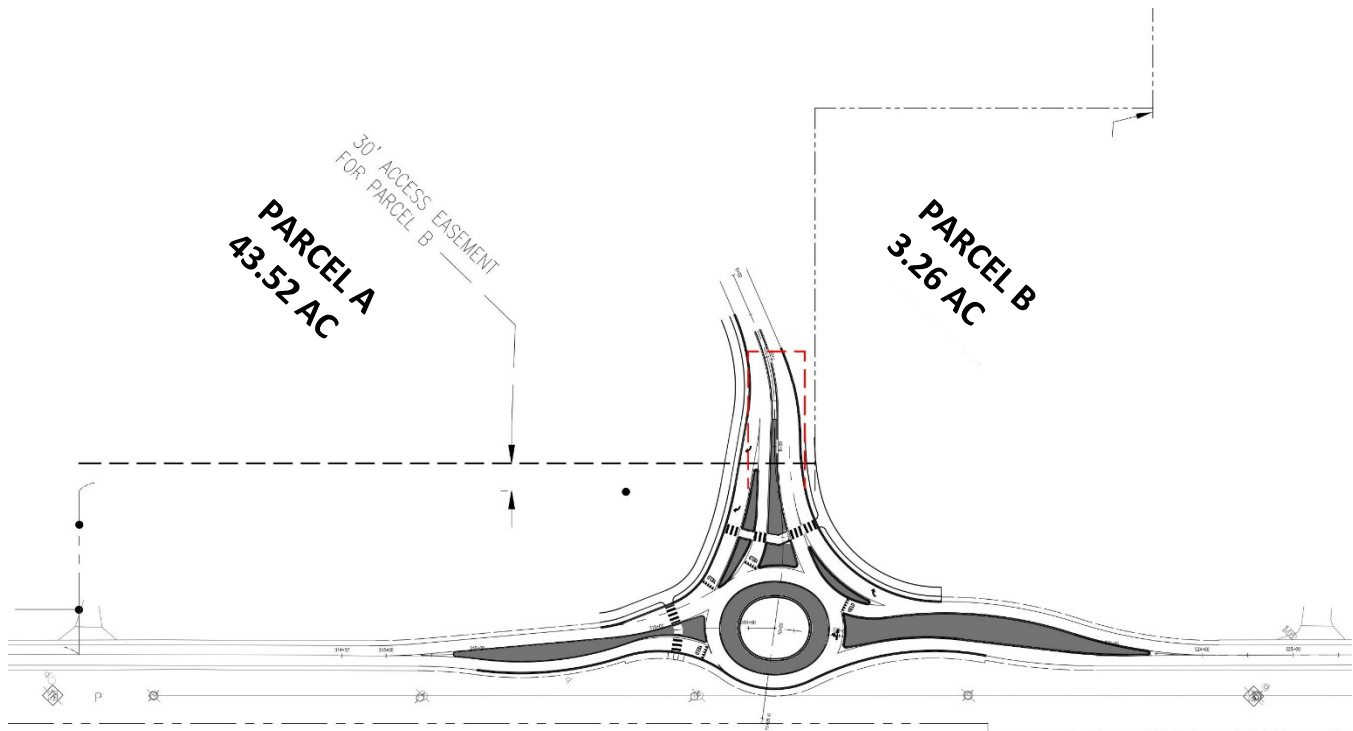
Skokomish Site Access Roundabout Layout and Parcel Location
